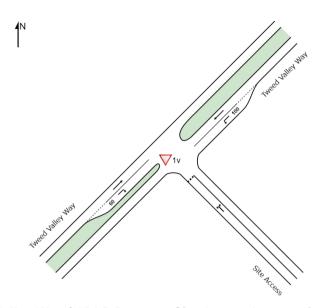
Tweed Valley Way / ABLP Property Site Access Intersection (Proposed Layout)
